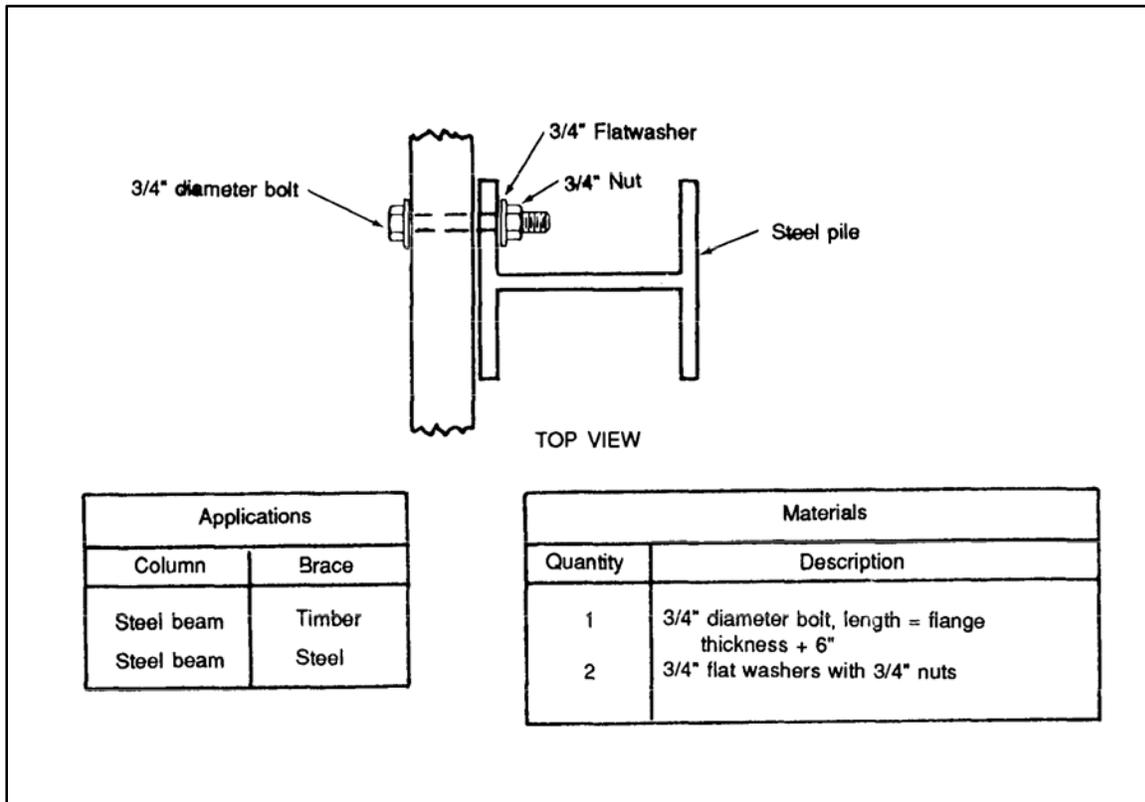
Brace connected to steel beam pile (bracing method 2)
